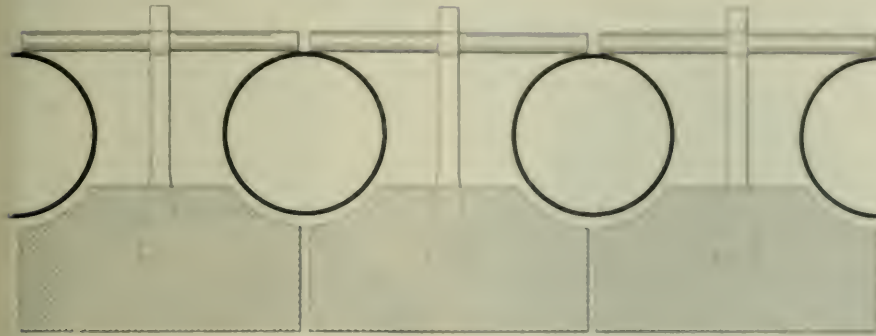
FURNACE ROOF SUPPORTED BY ATTACHMENTS MOLDED INTO BRICKS.
